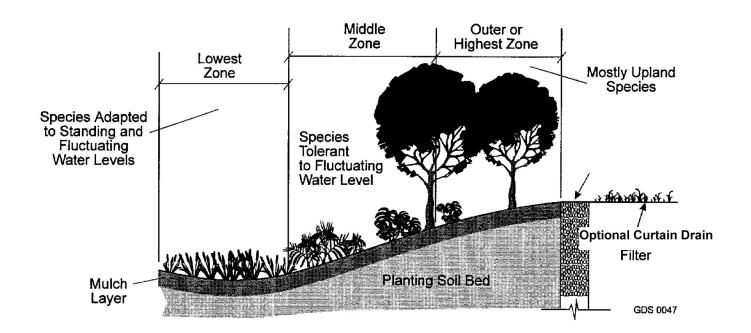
Planting Zones for a Bioretention Facility (Source: MDE stormwater manual, Appendix A)
